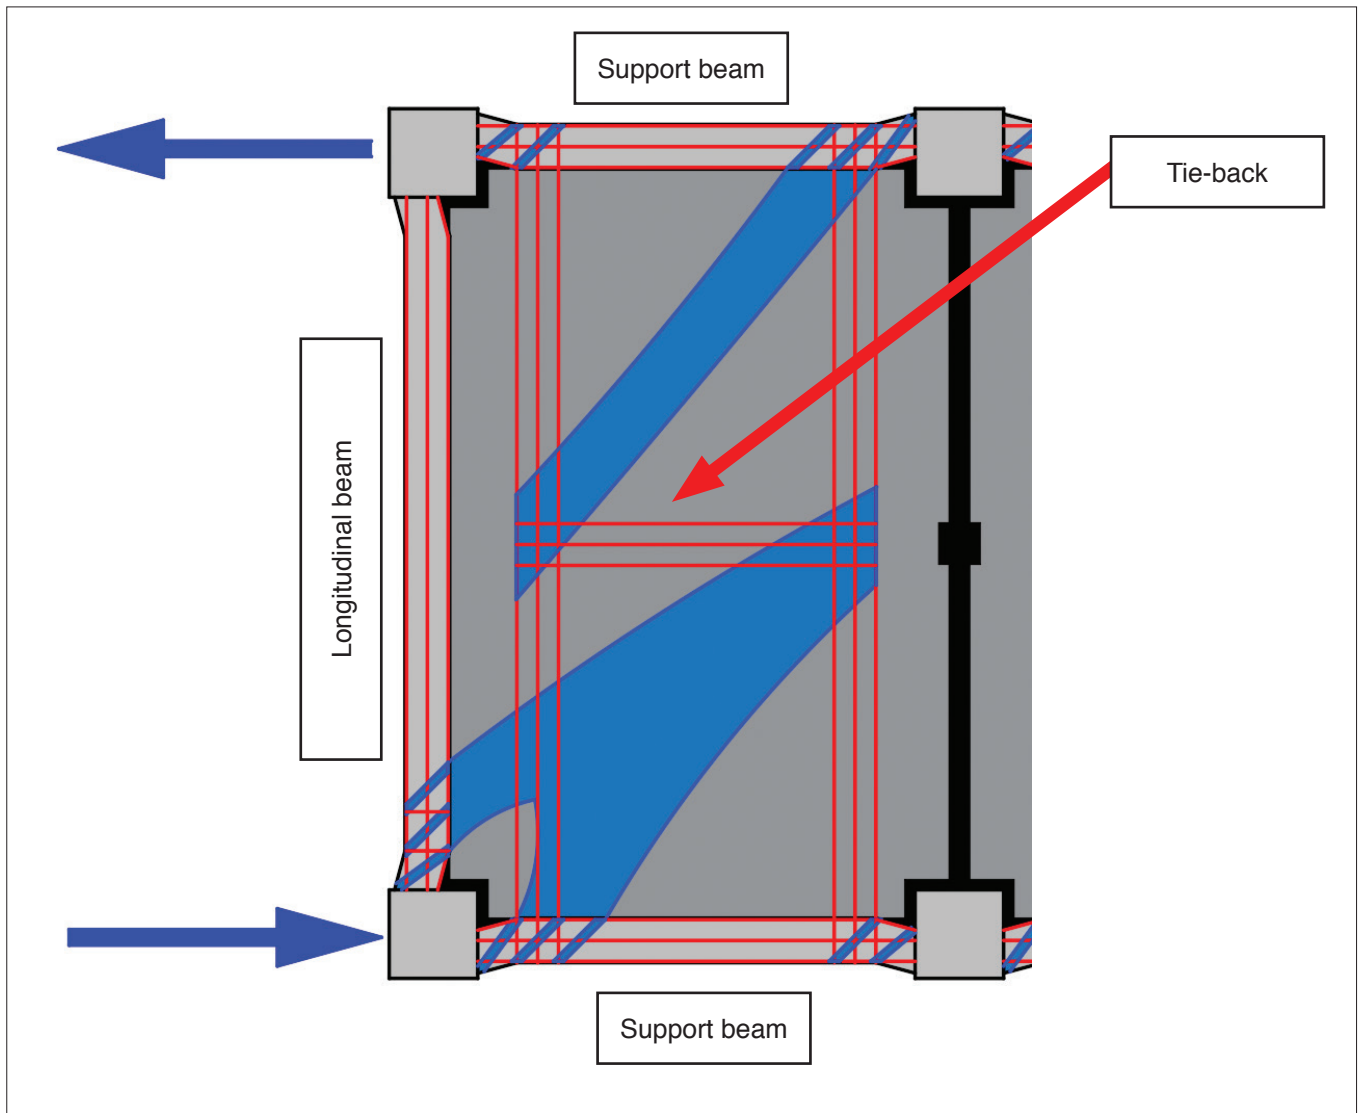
Diagonal struts with tie-backs to form low energy truss strut-and-tie load paths within the floor-plate
